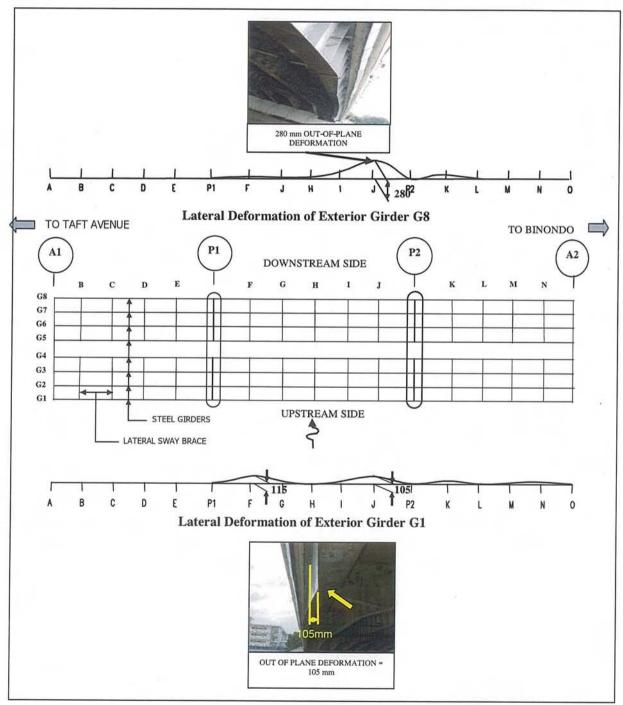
Lateral Deformation of Exterior Girders - Shapes and Dimensions
